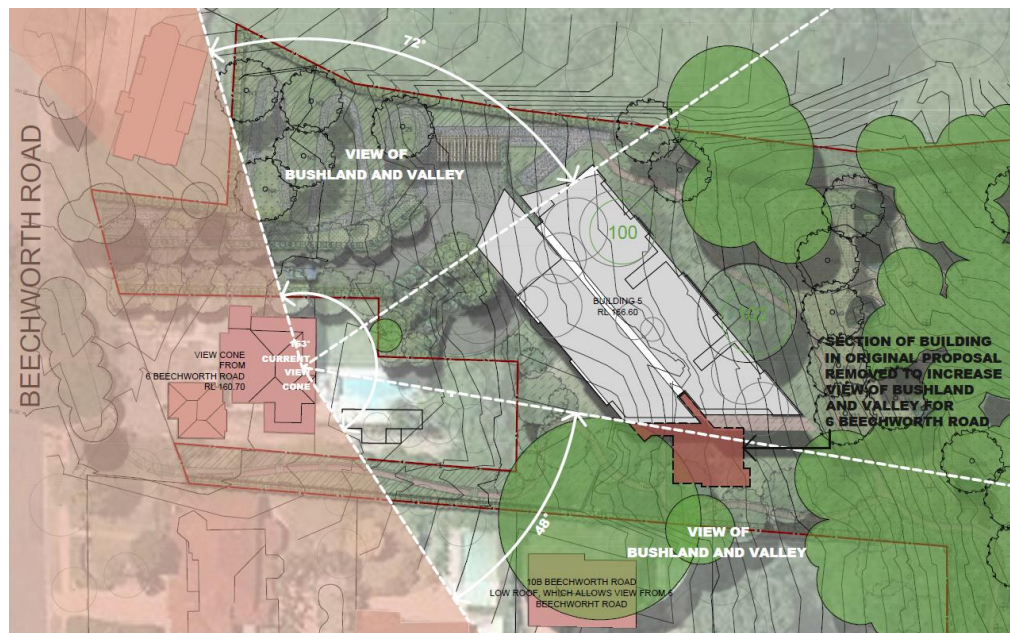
BUILDING SEPARATION BETWEEN BUILDING 5 AND 6 BEECHWORTH ROAD
